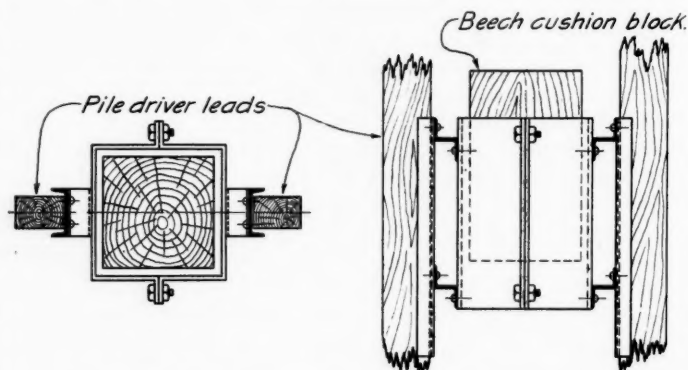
Cast Iron Hood Used on Head of Concrete Piles.
